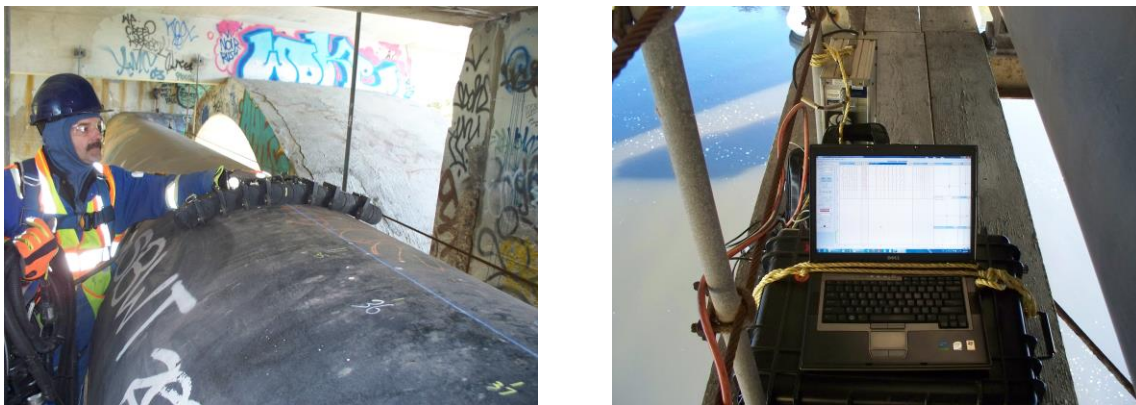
48” pipe underneath bridge with inspection tool being used to scan it (left) and plank walkway (right).
